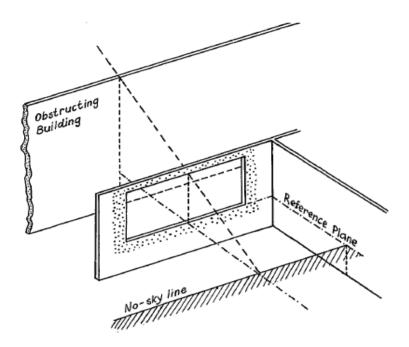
No-sky line for obstructing building parallel to window. Source: (Yip, 1972)
